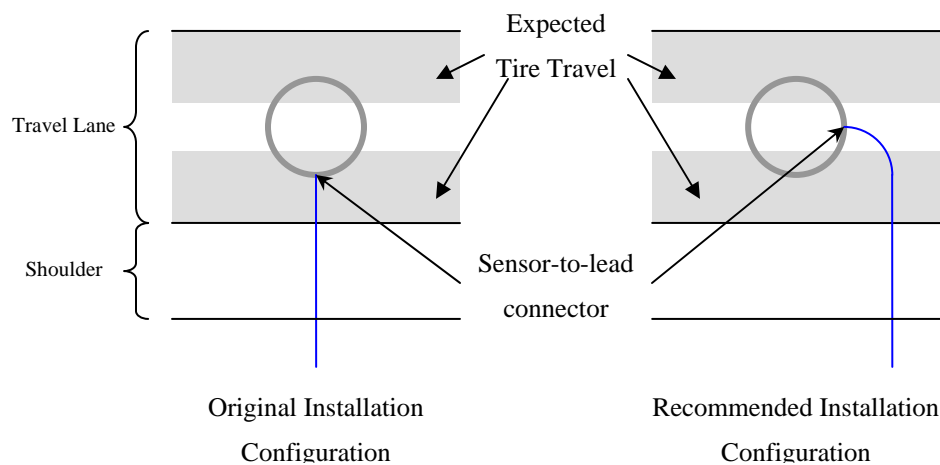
Proposed installation configuration of preformed surface-mounted inductive loop sensor
